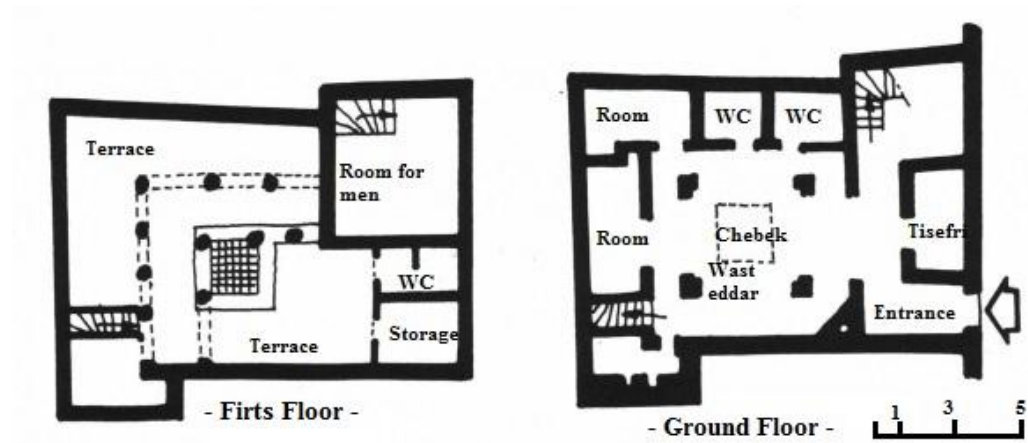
M'zab* House Plans (Golvin, 1989).
